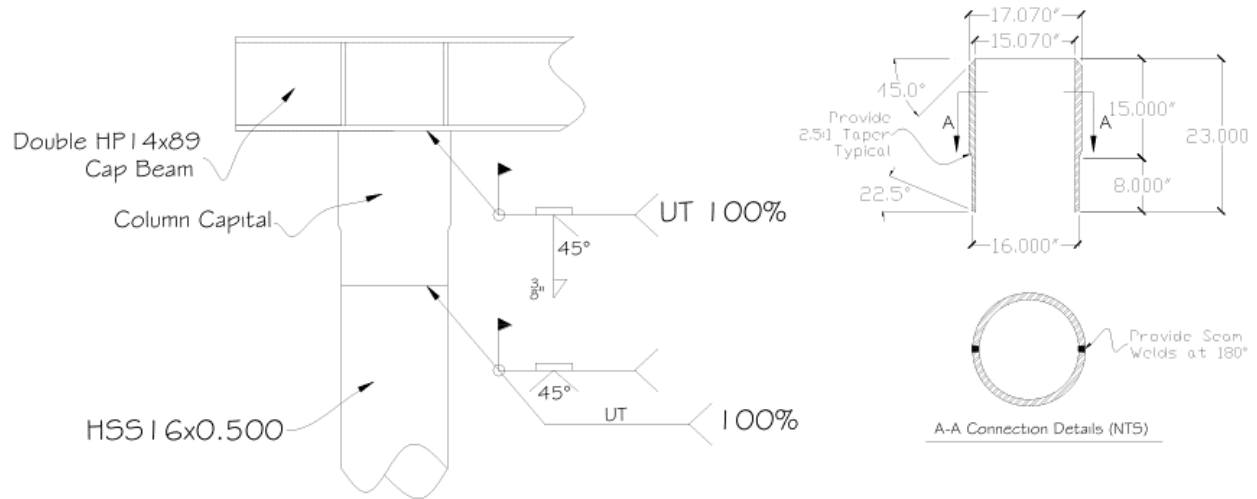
Column capital connection detail (Fulmer et al., 2013)
